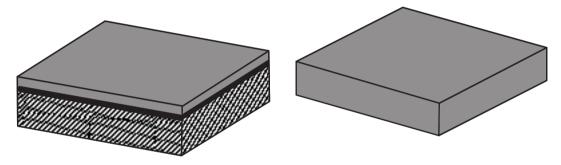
1 m^2 floor system for cross-laminated-timber (left) and concrete (right)
